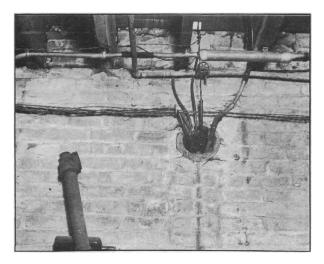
LOWER END OF CHIMNEY FLUE USED TO CONVEY ELECTRIC WIRES FROM THE ROOF TO THE BASEMENT.
